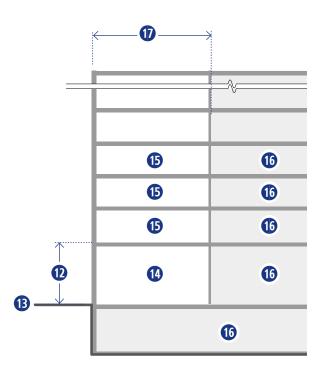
Shopfront Building: Floor-to-Floor Height & Use Requirements
